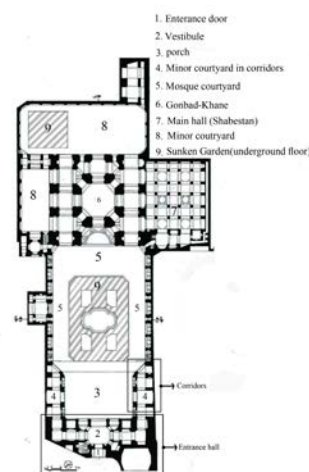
FIRST FLOOR PLAN, GANJNAME (2001).
